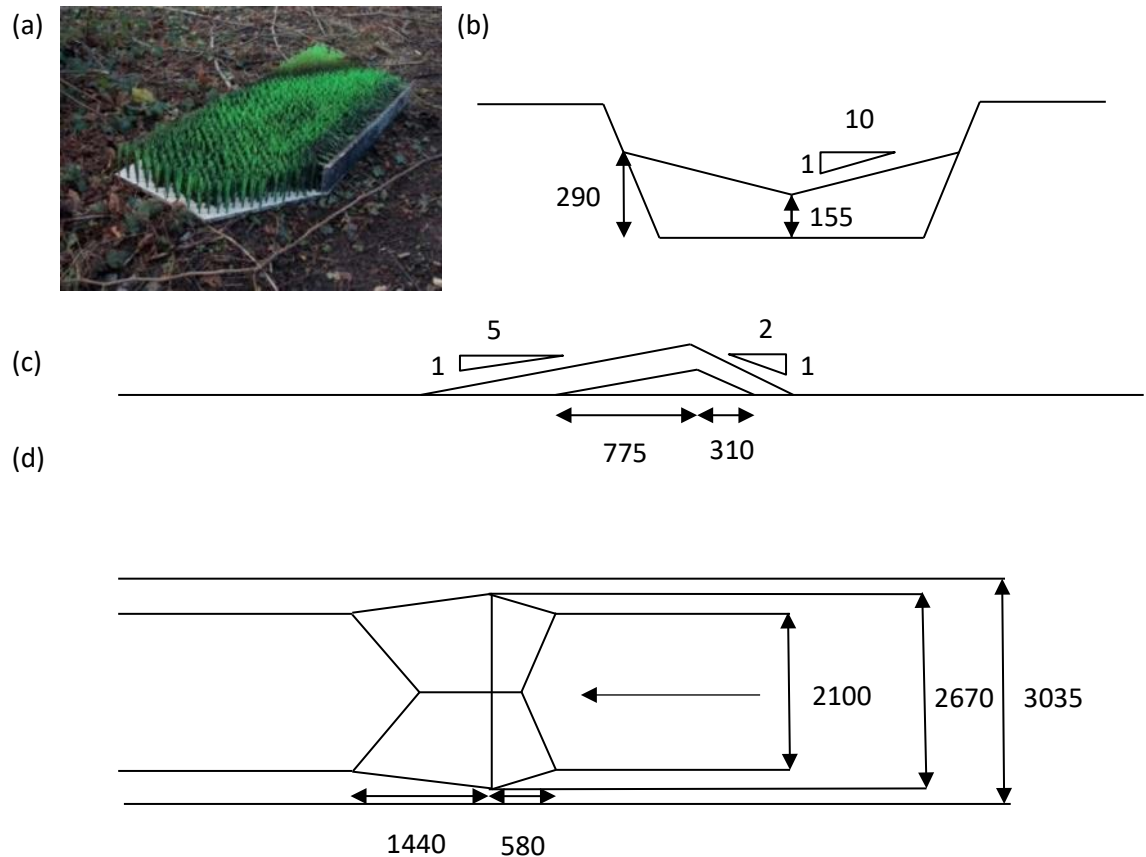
(a) Bristle boards and the flat-V weir in (b) section, (c) elevation and (d) plan, illustrating the unmodified bristle substrate and the weir dimensions used in experimentation (distances shown in mm).
